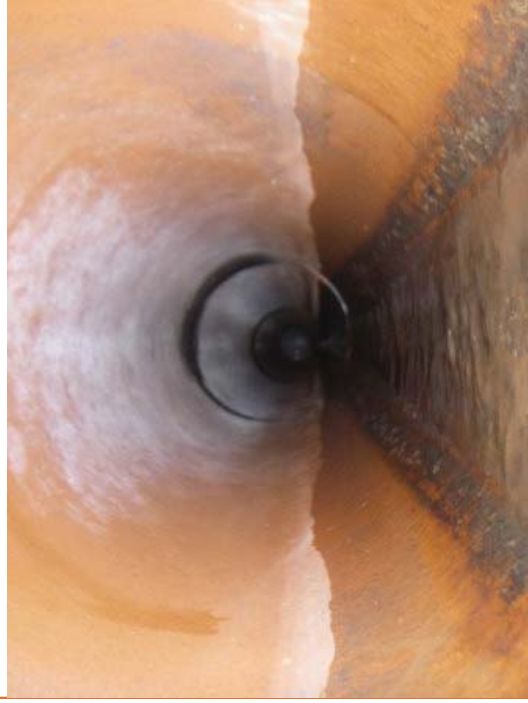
Outfall 001: 001-001 Pipe Connections (east pipe)
